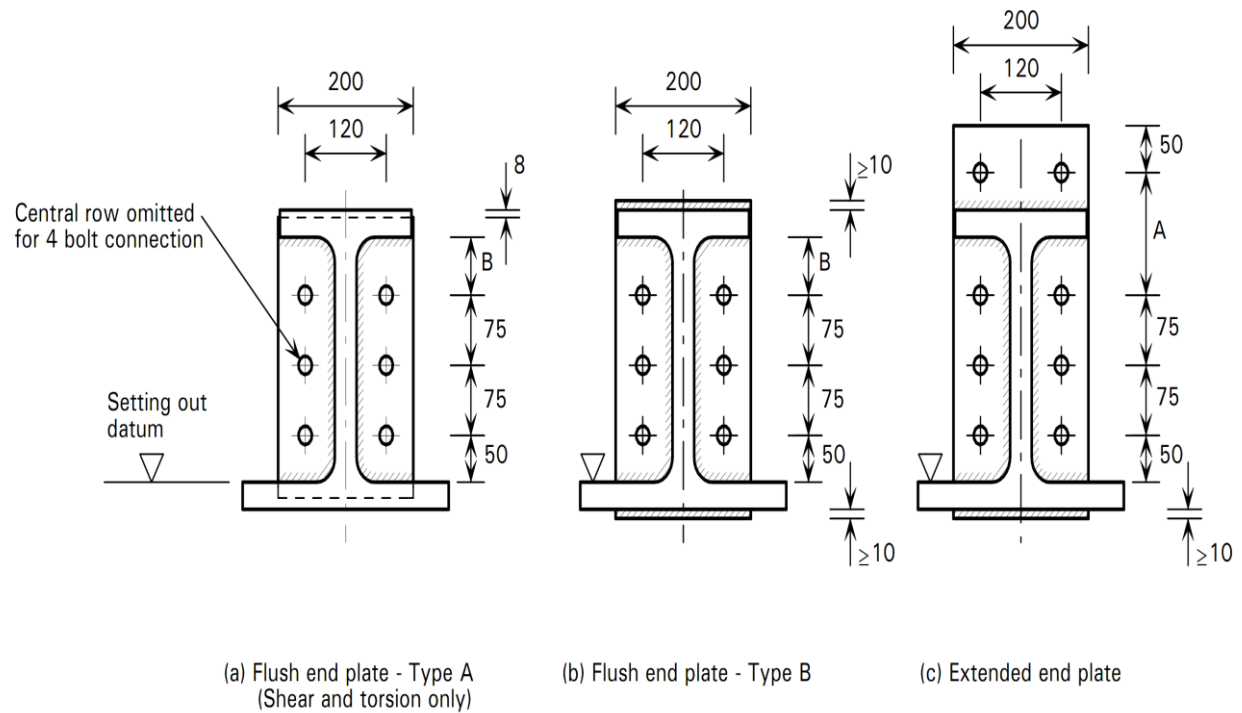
Recommended detailing dimensions for end plate connections to ASB sections
